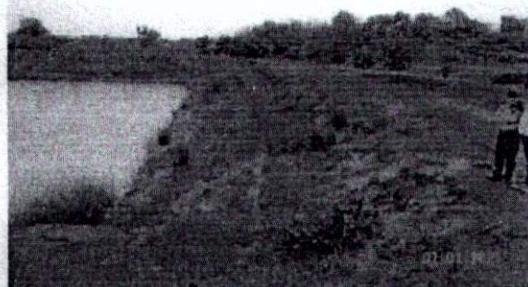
Photo of road adjacent to the site near at Chandradeepa village
